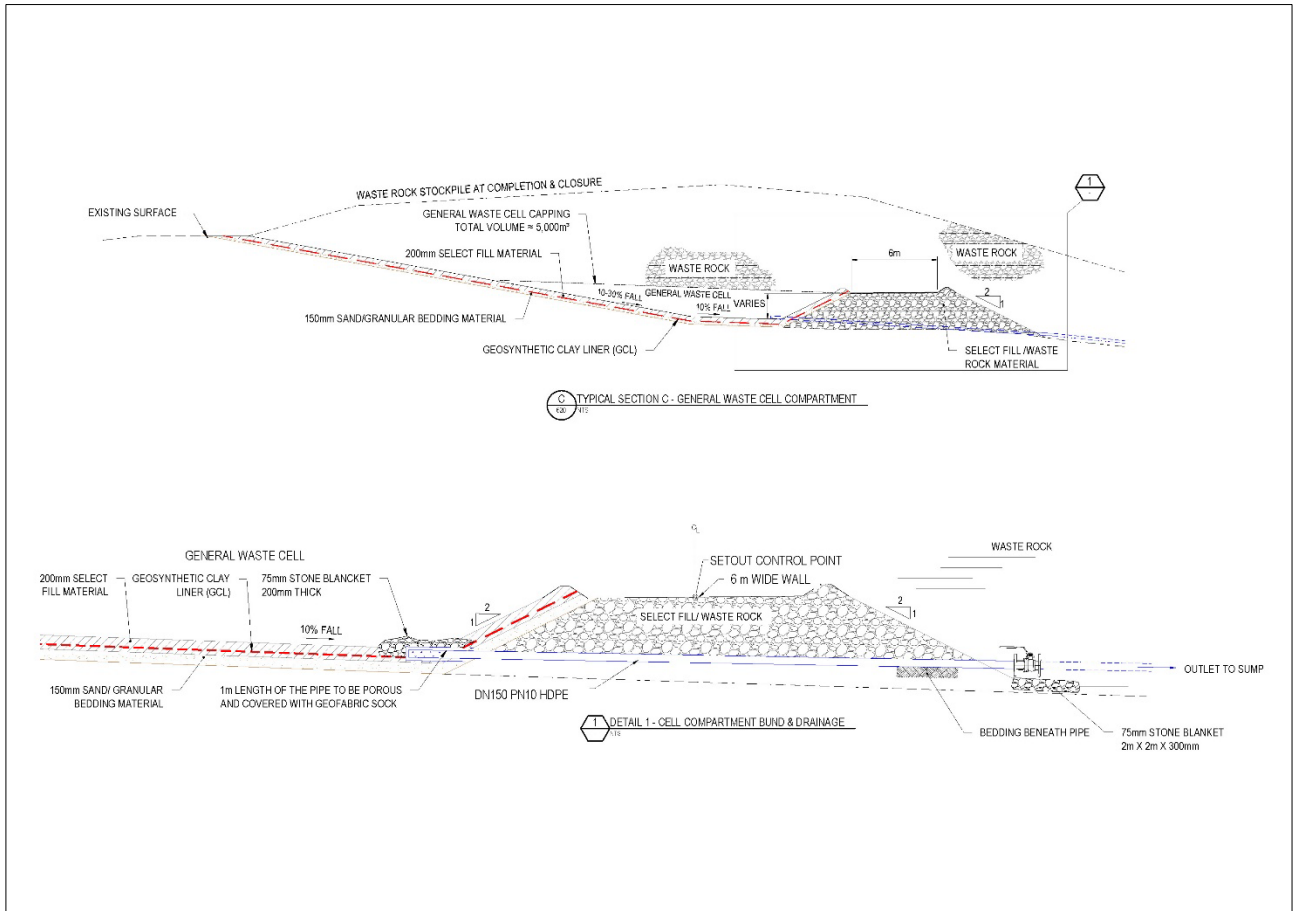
Predicted Landfill Layout - Detailed Cross Section
